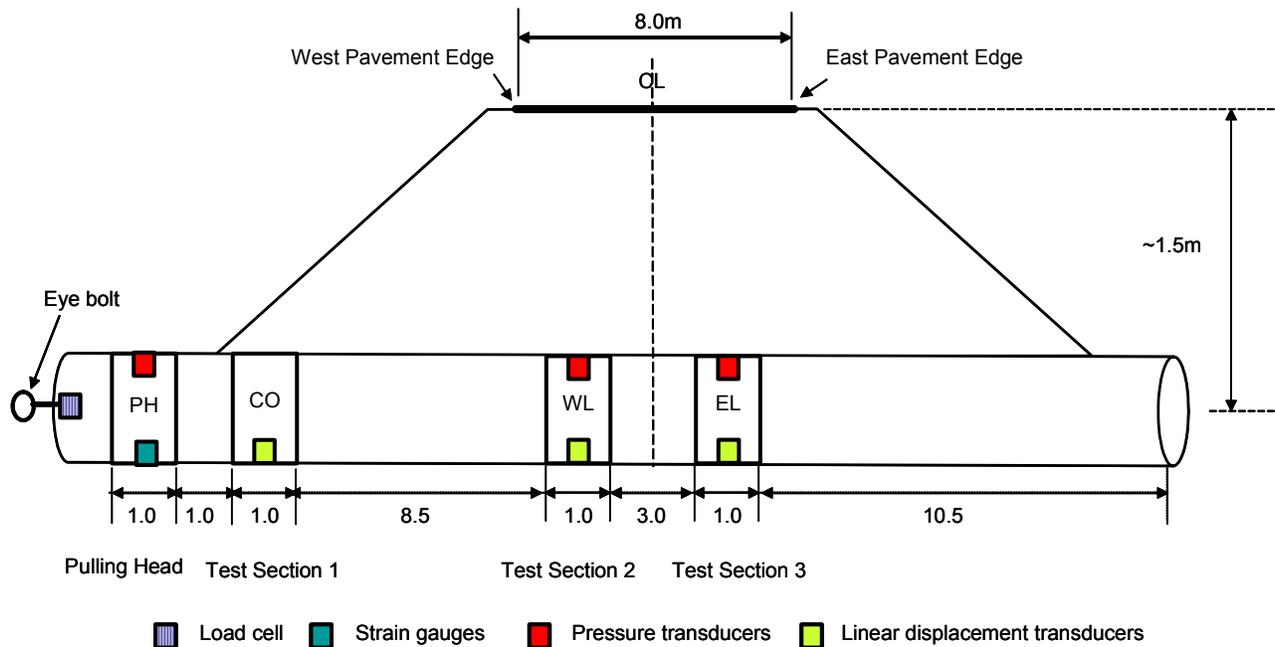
Layout of the 20 sensors placed inside the HDD installed pipe.
